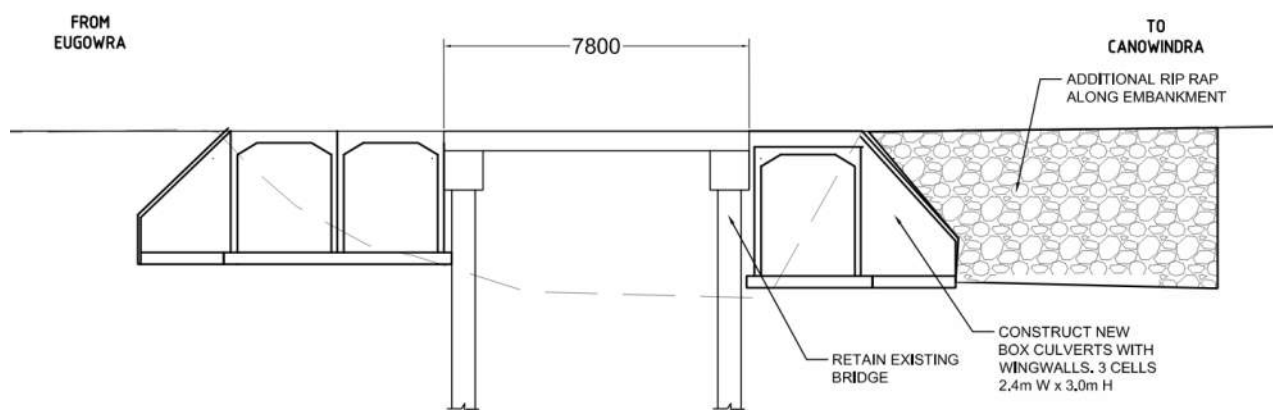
Option 3b - Box Culverts Used to extend bridge span.
